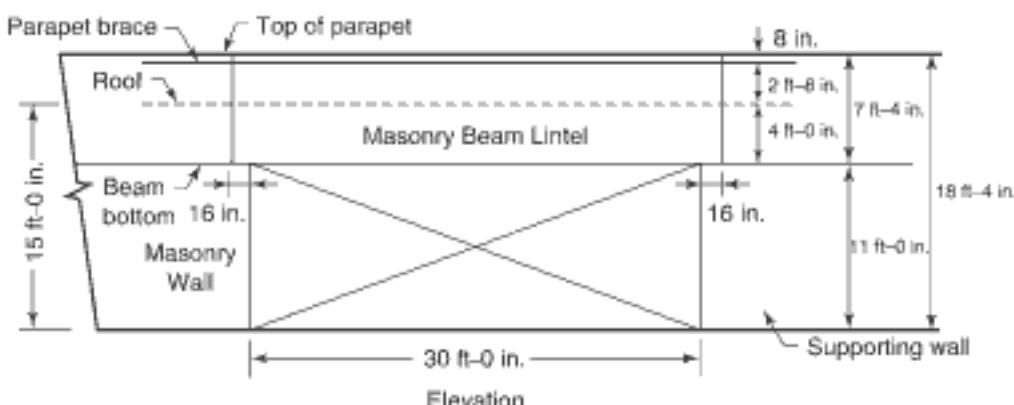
Masonry Concrete Lintel and Wall in Example 17.7.
